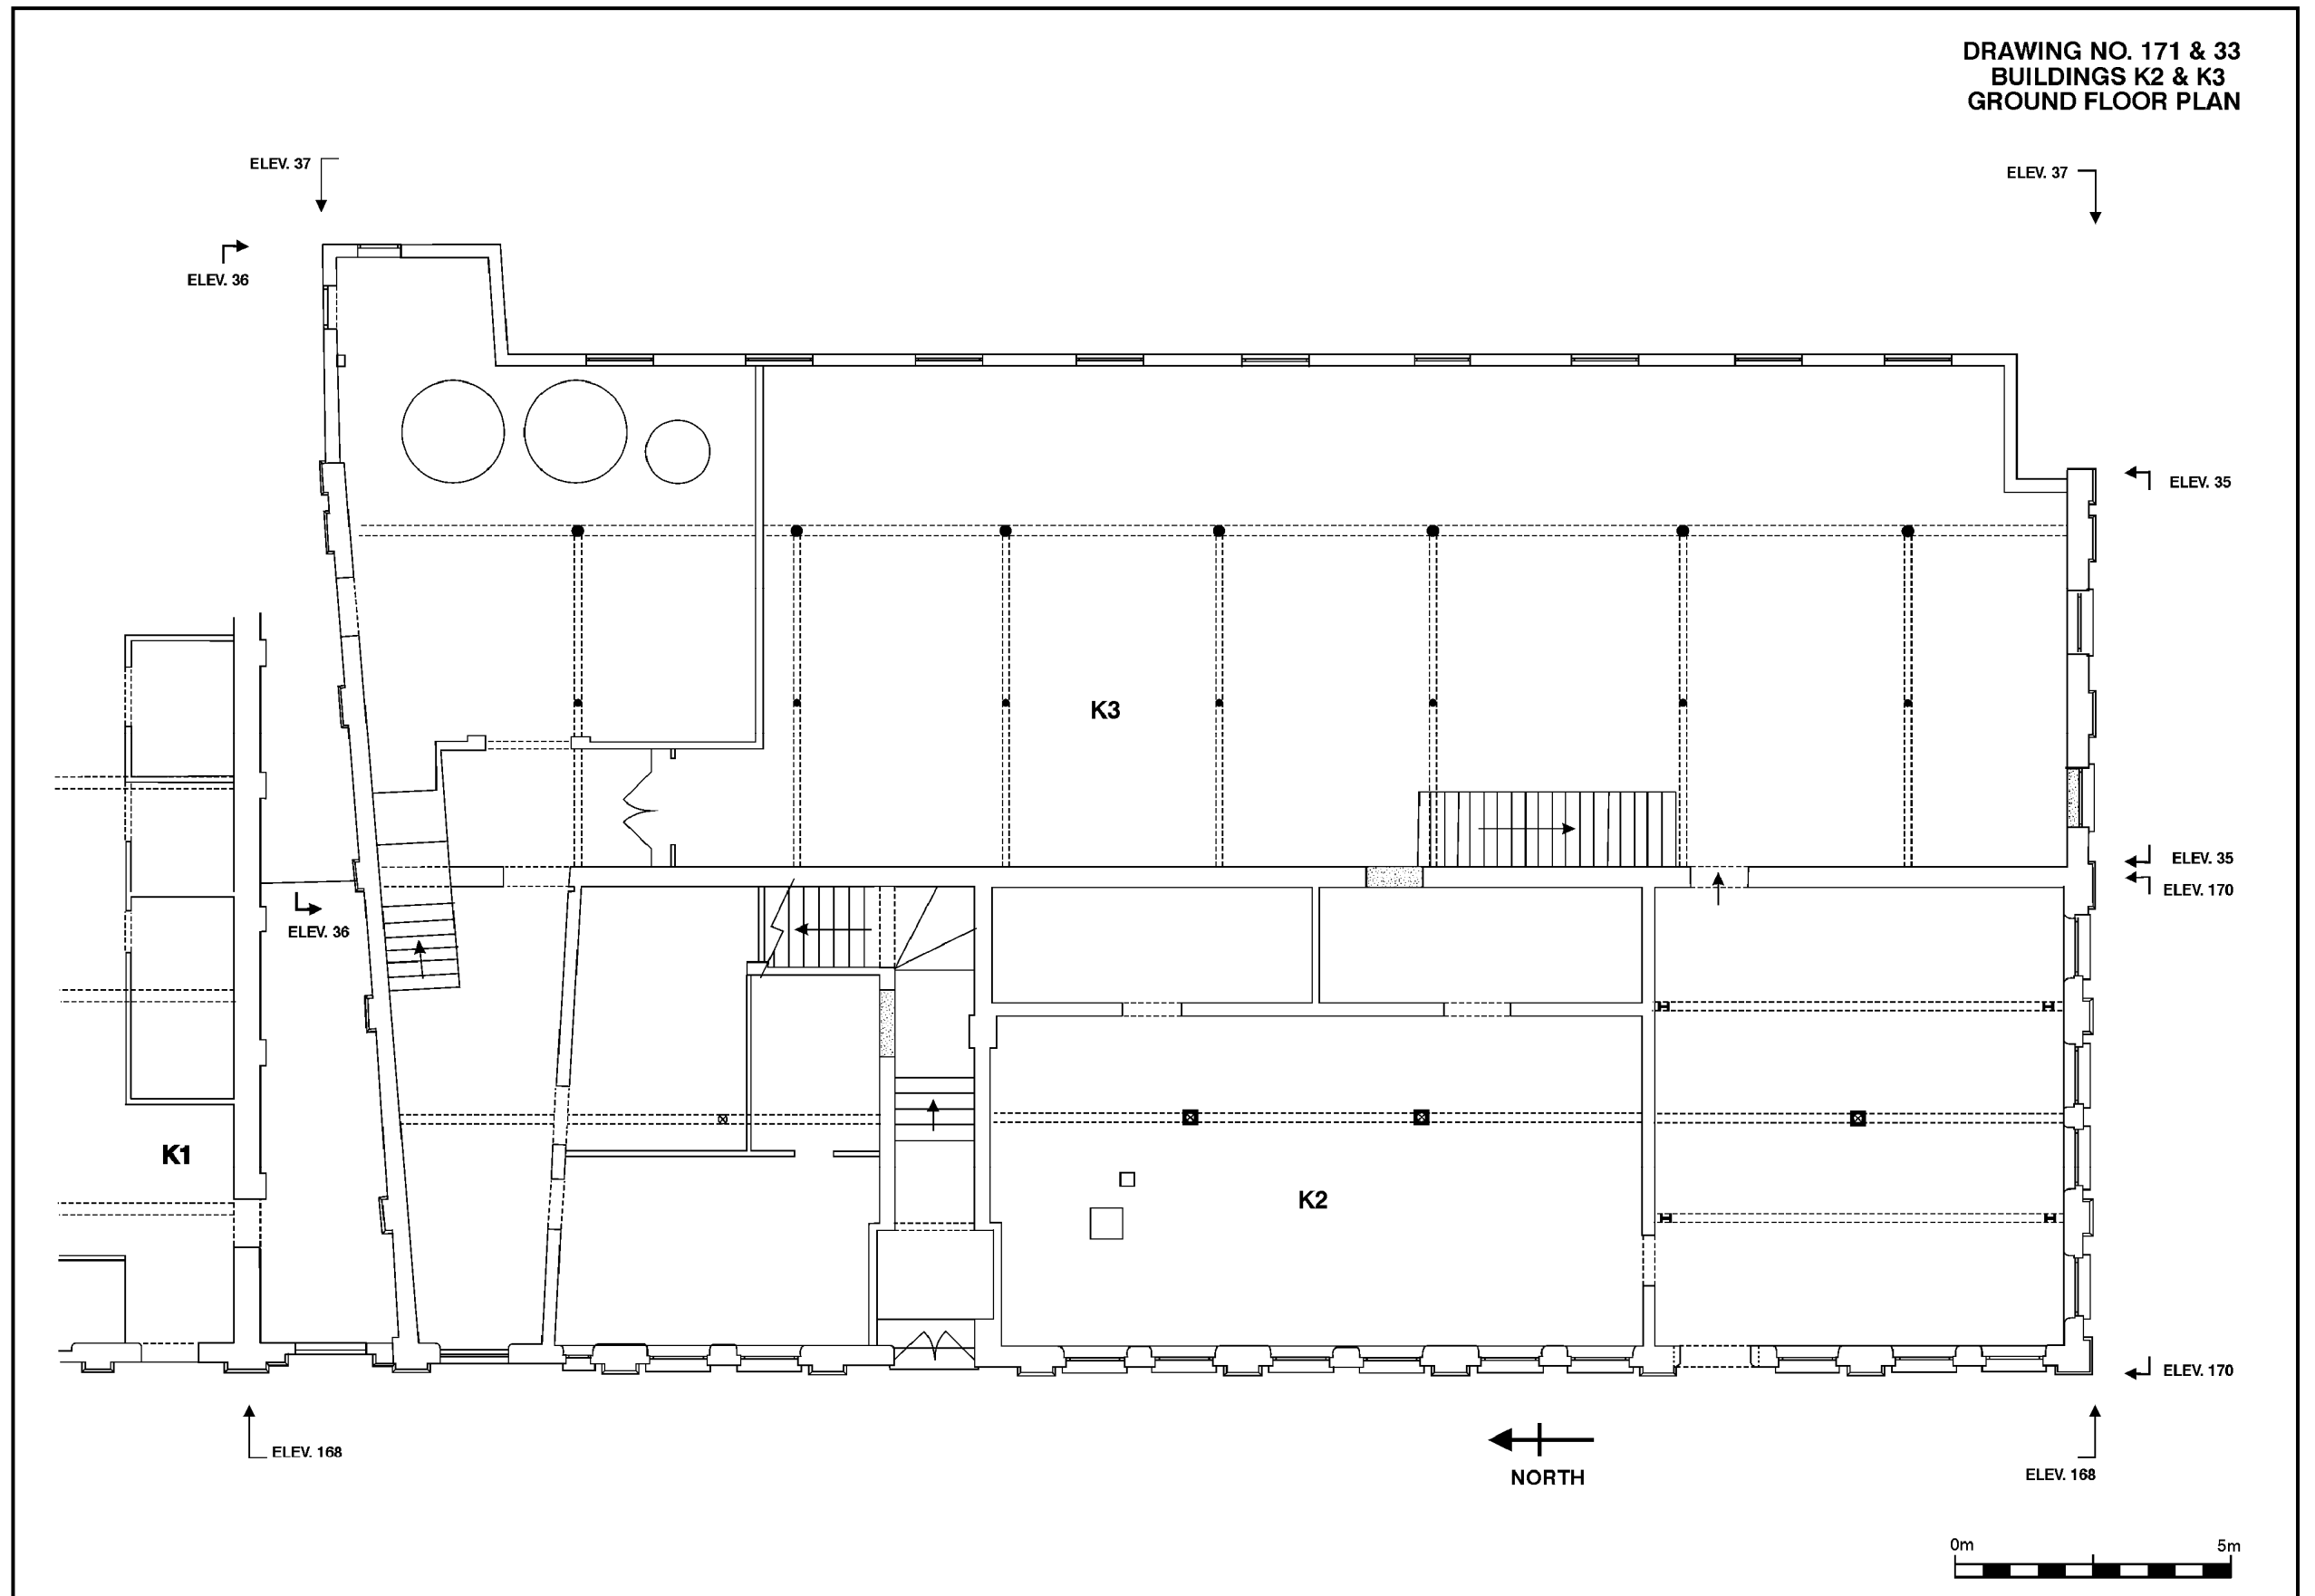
Ground floor plan of K2 and K3 (scale 1:125)
